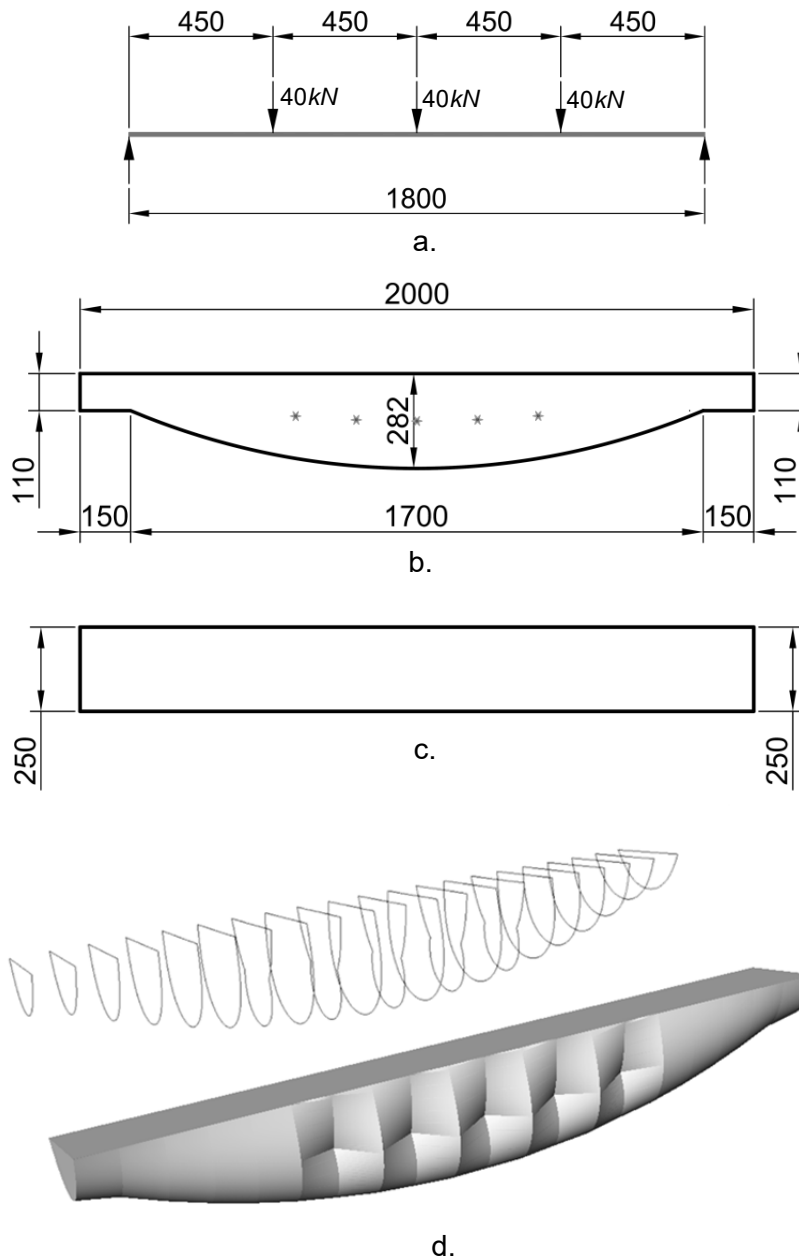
FFB 11R and FFB 11 geometry details: (a) loading arrangement, (b) elevation, (c) plan and (d) perspective view (all dimensions are in mm)
